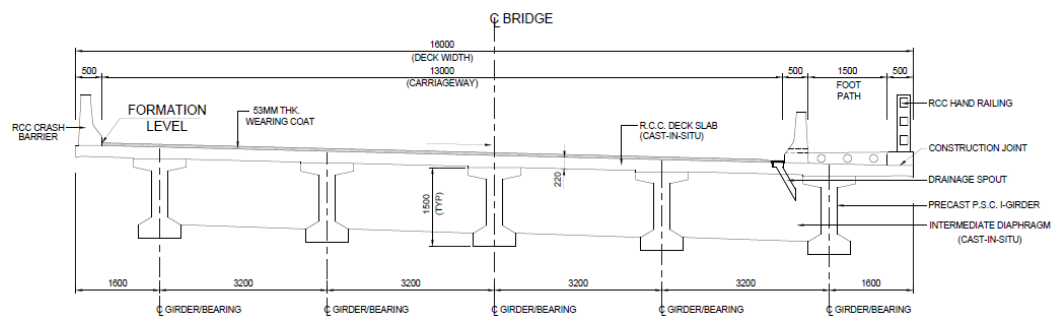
3 Cross section of 25m span OC post tensioned I girder at mid span
